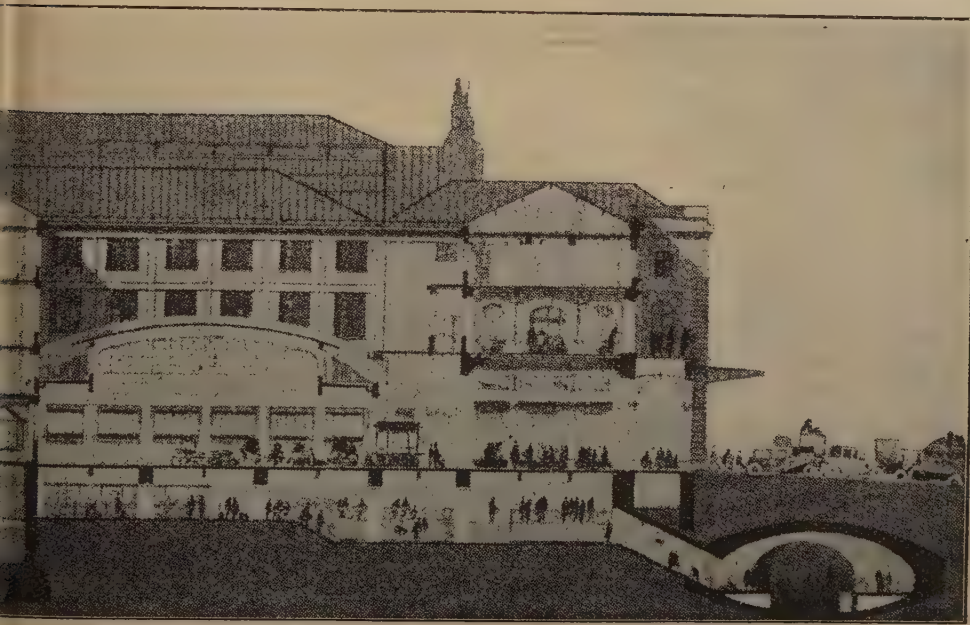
Cross-section shewing (left foreground) the incoming baggage road
